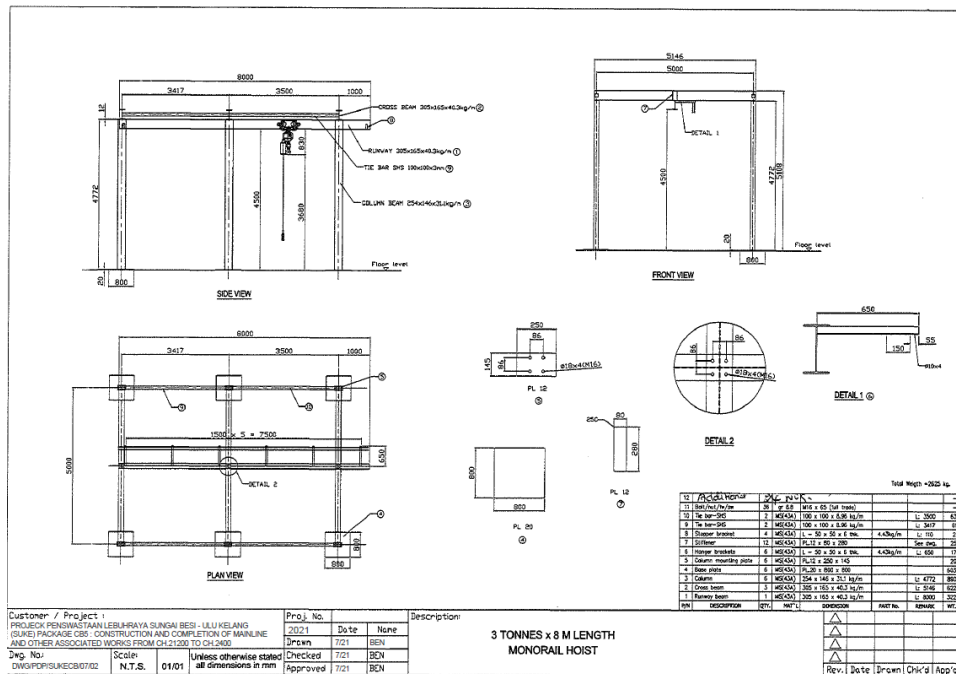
3 tonnes monorail hoist gantry crane detail
